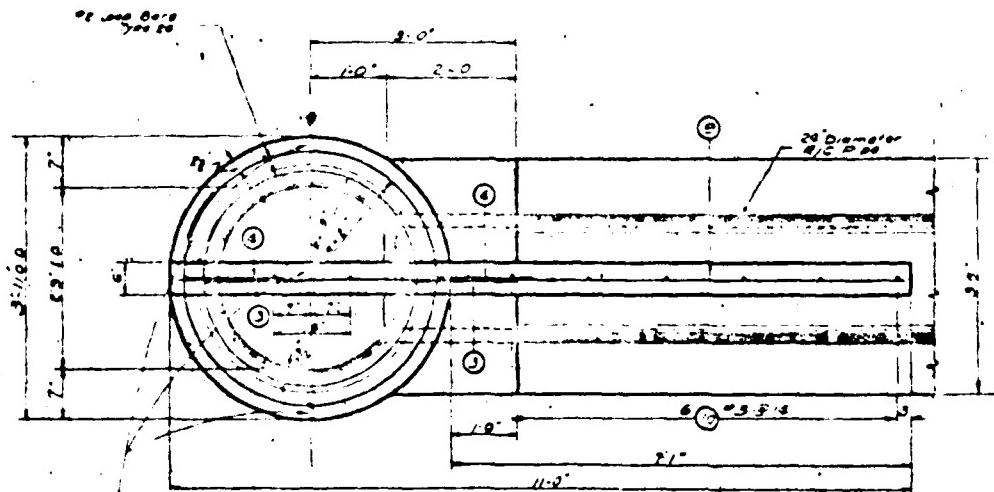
DETAILS OF EXPANSION JOINT AND TYPE III CRADLE
